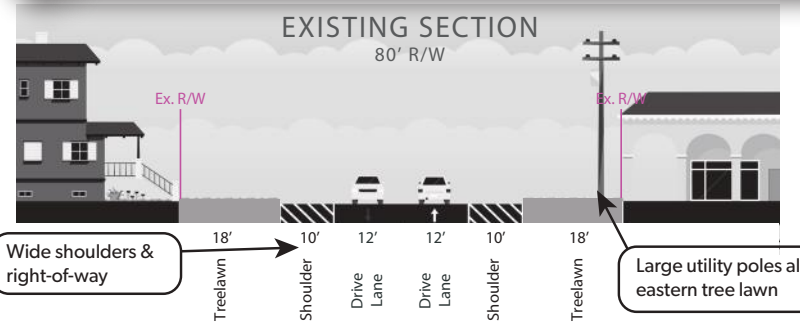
Cleveland-Massillion Road Typical Section (North of Ira)
